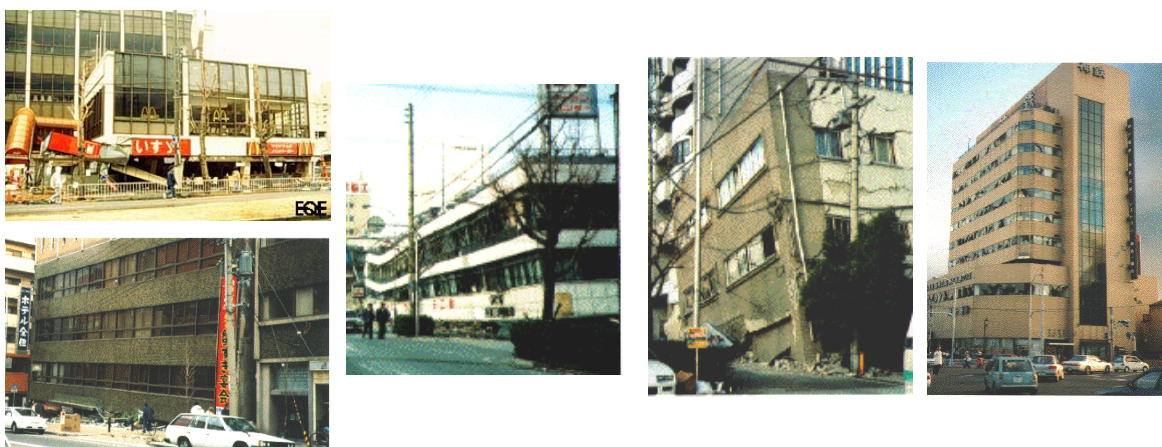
Soft-storey building' collapses (EQE, 1995; KOBEnet, 1995)
